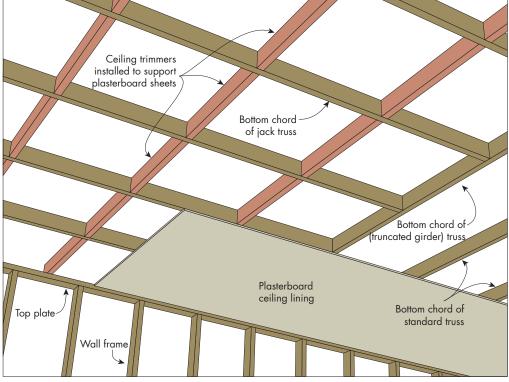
Trimmers to Support Ceiling Lining at Change of Truss Direction Perspective
